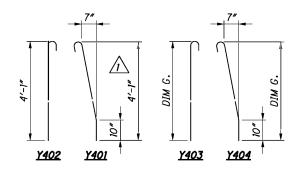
DETAIL - END ANCHORAGES AT TUNNEL EXP. JOINT AND ADJACENT DOOR
